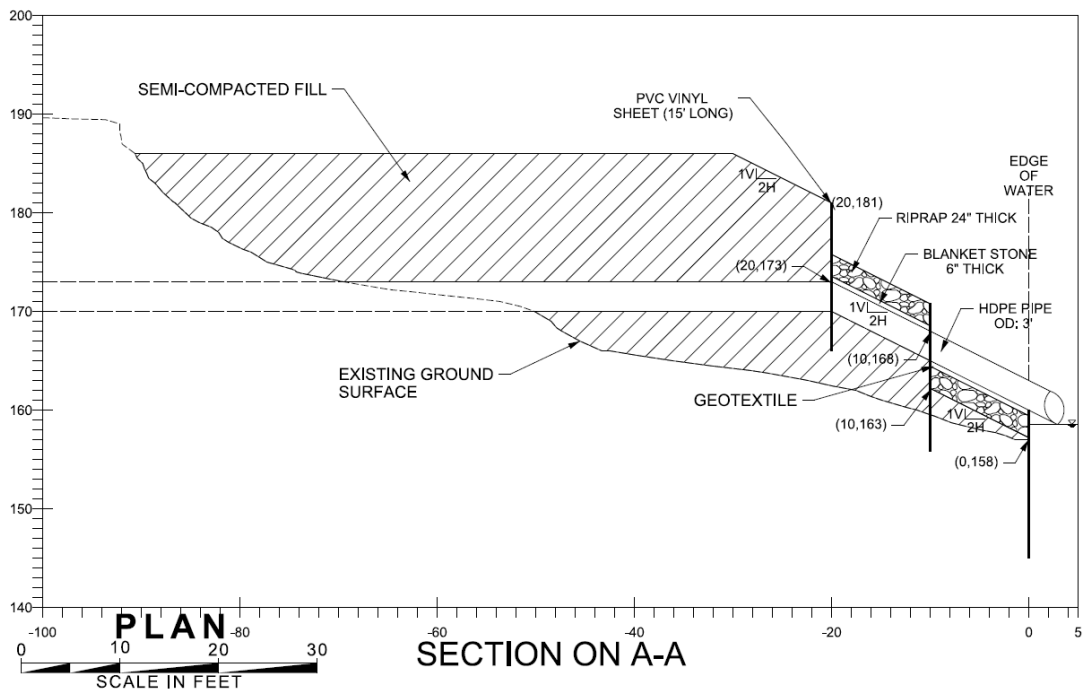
Alternative 2 – Fill and Tiered Sheet Piles
